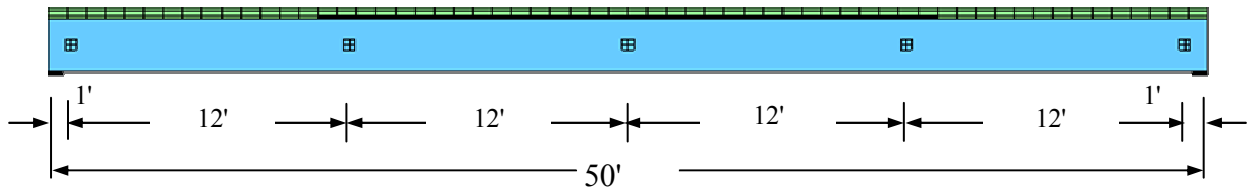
50 ft span bridge model constructed using 36 in. wide box-beams.
